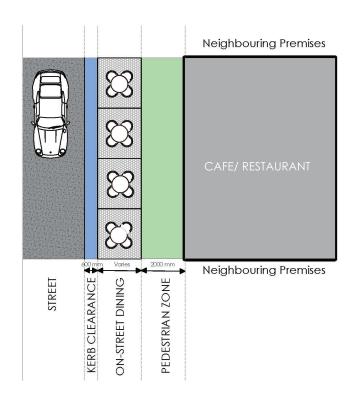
Plan showing minimum 2.0m pedestrian zone in relation to on street dining zone and kerb clearance.
